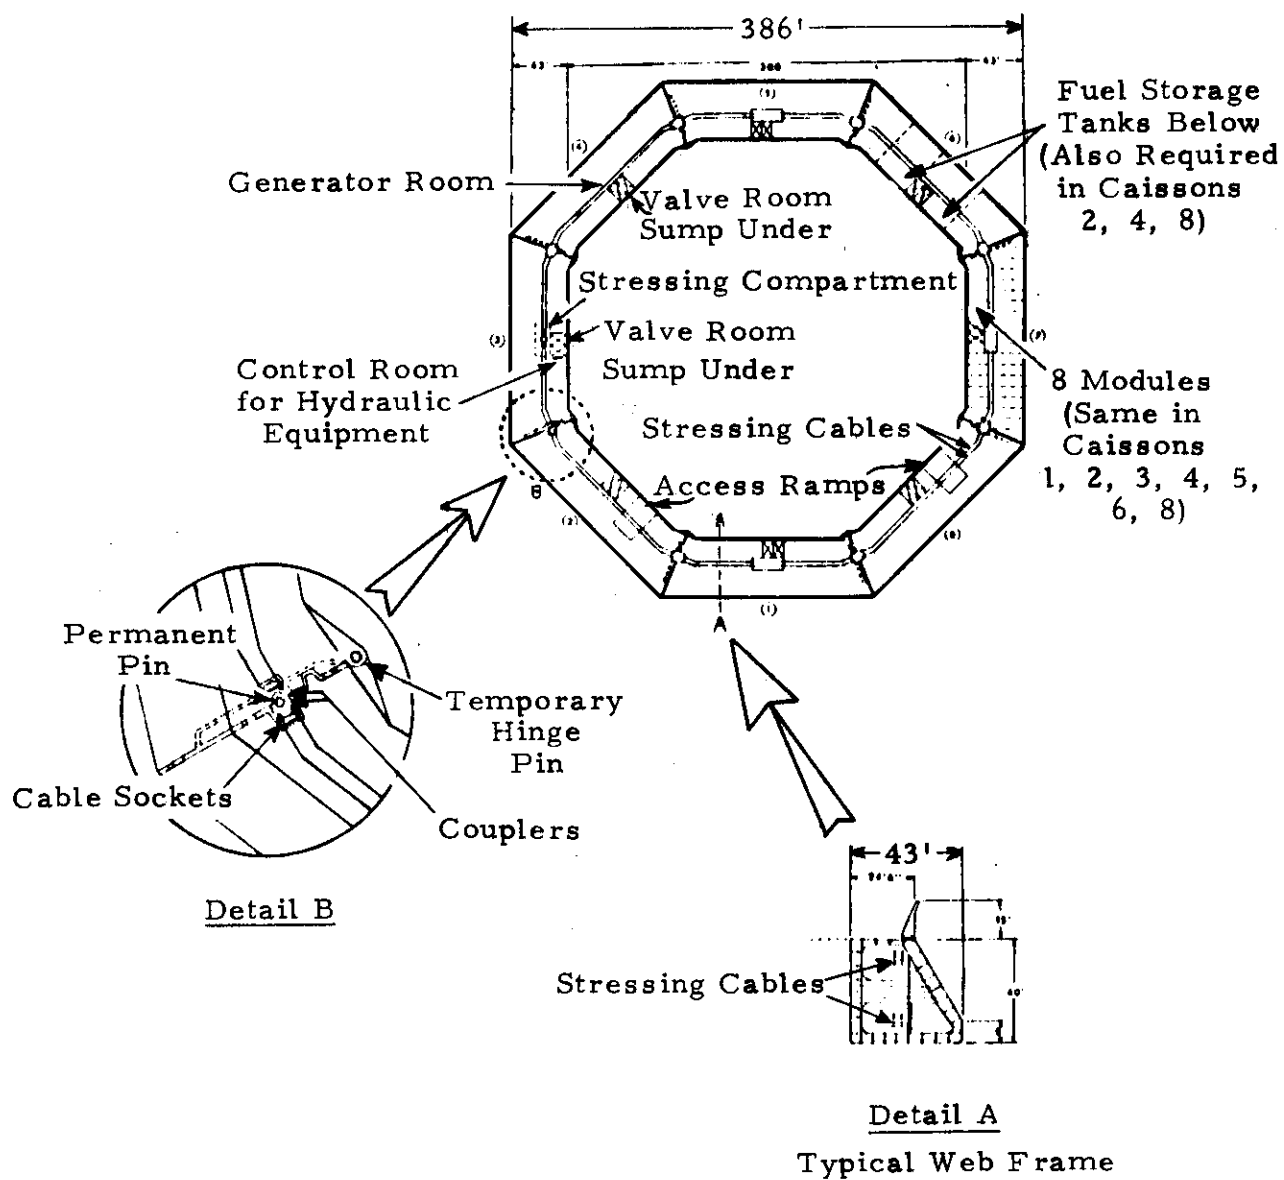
Caisson Retained Island, Simplified General Arrangement
